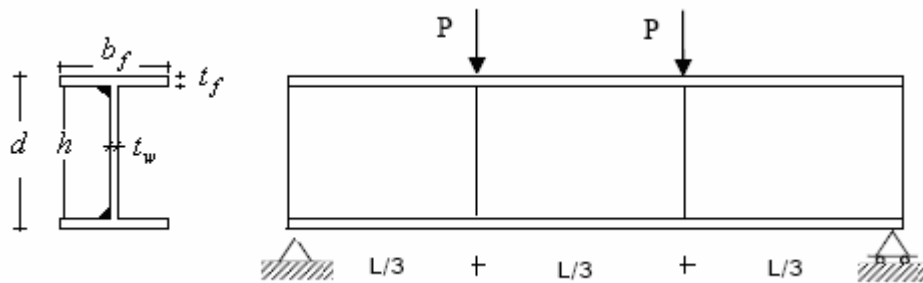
Beam Specimens With Fillet Weld on One Side of the Web
